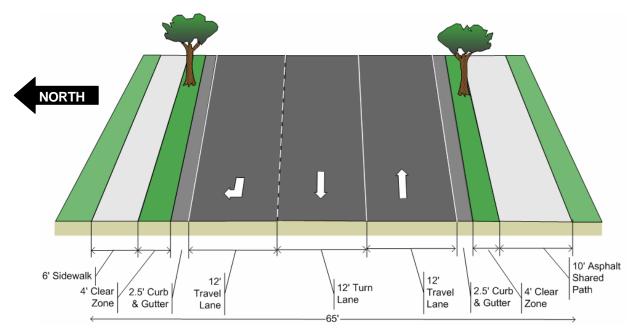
Recommended Typical Section with Outside Turn Lane
